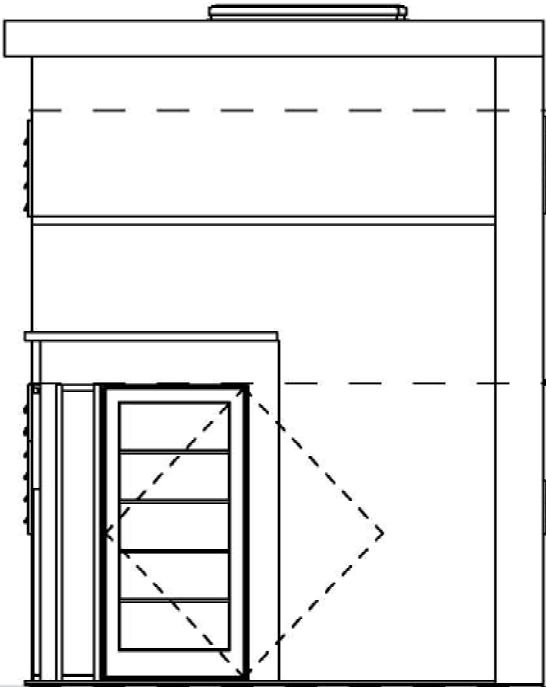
ELEVATION 1: SCALE 1/4" = 1'0"
